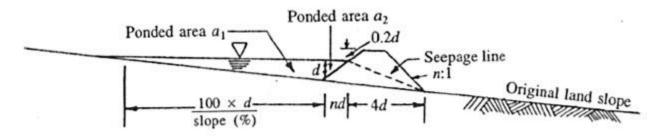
Layout of contour bund. (Source: Das, 2002)
